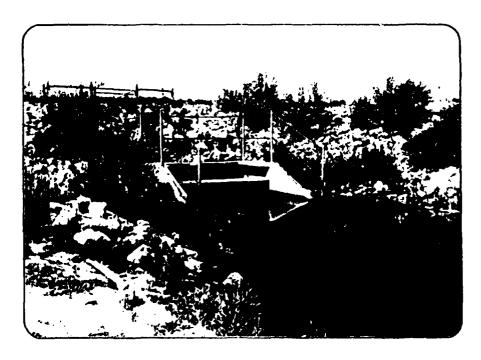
View of Outlet Structure of Principal Spillway of Upper Dam
